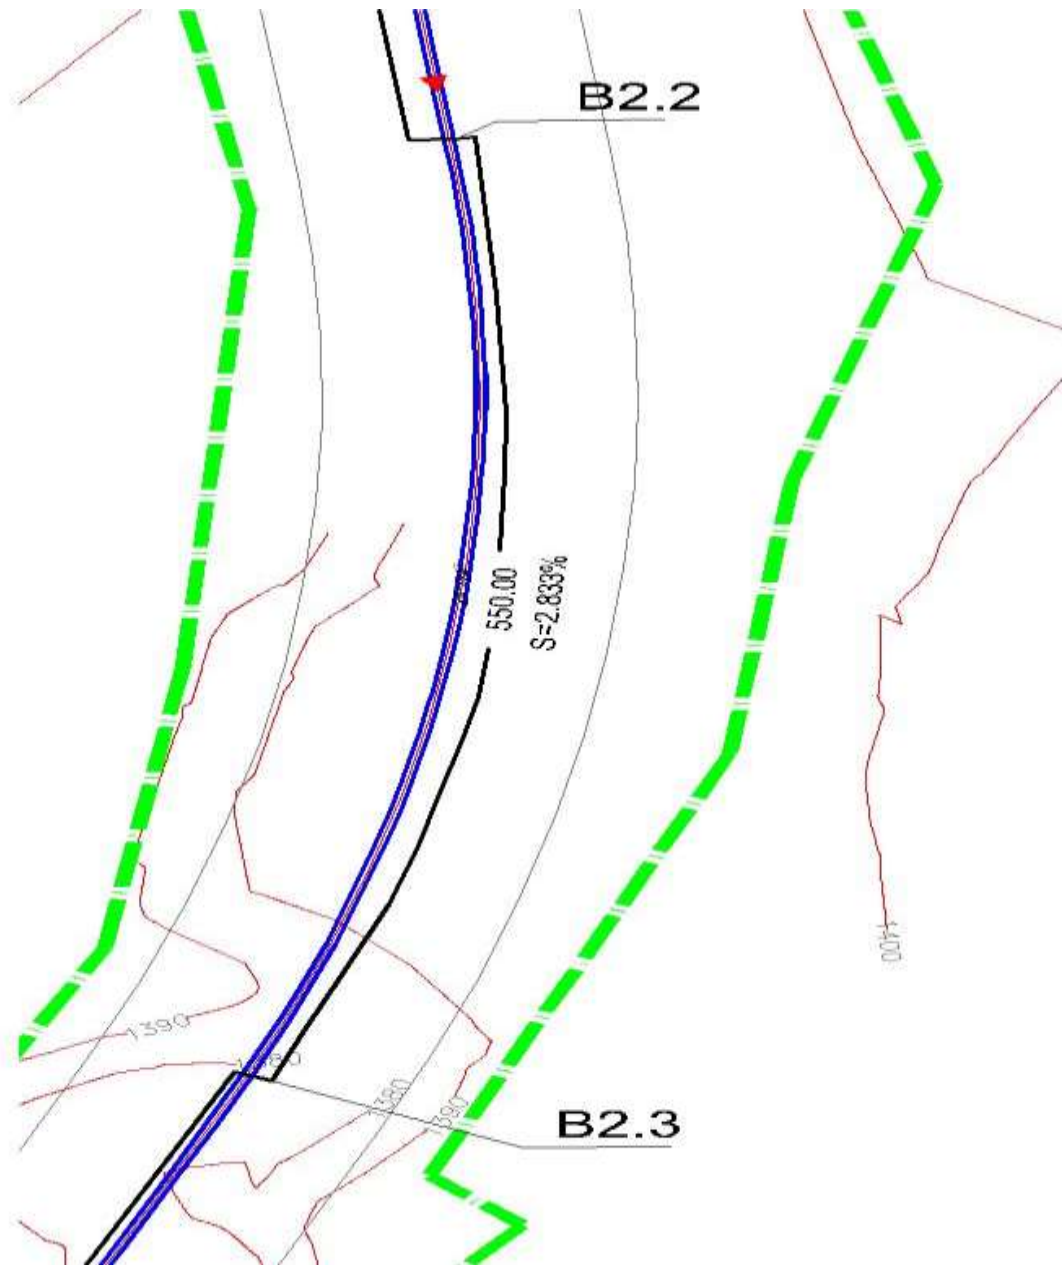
Storm drainage layout plan of Sub-catchment-1 part six
